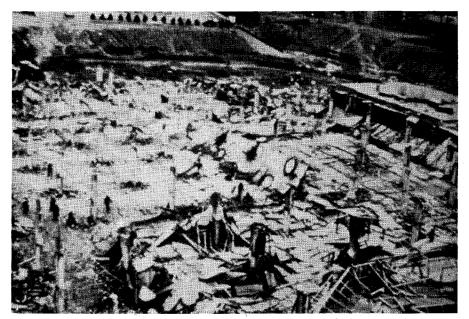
Collapse of cast-in-place post-tensioned parking garage which was struck at one edge by falling tower crane and debris (Bailey's Crossroads, Virginia).
